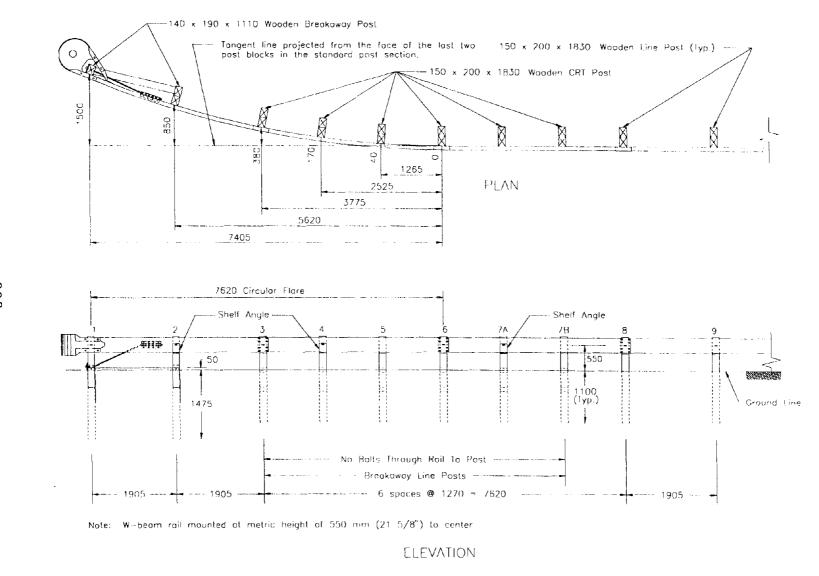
Details of modified MELT used in test 471470-35 and 36.
